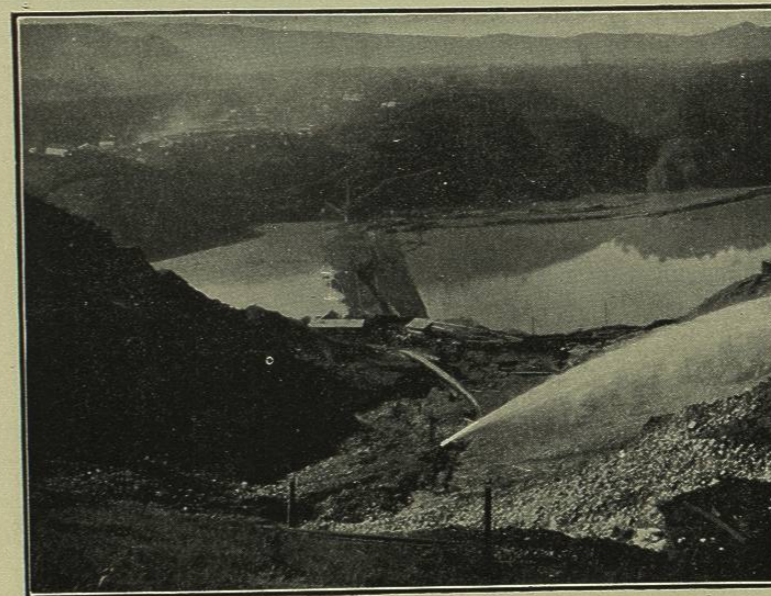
HYDRAULIC MONITOR IN ACTION, WITH 30 SECOND-FEET UNDER 180 POUNDS PRESSURE, 6-INCH NOZZLE. UP-STREAM TOE OF DAM SHOWN, WITH TAILING POND AT LEFT.
